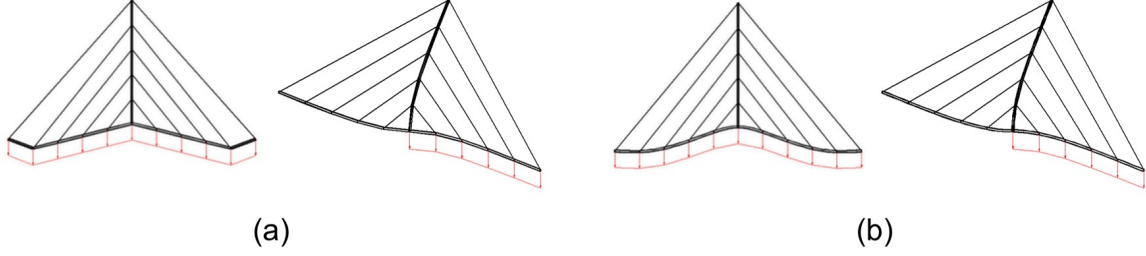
Deck and tower elements modelled as (a) truss elements, without bending rigidities, and (b) beam elements, with bending rigidities
